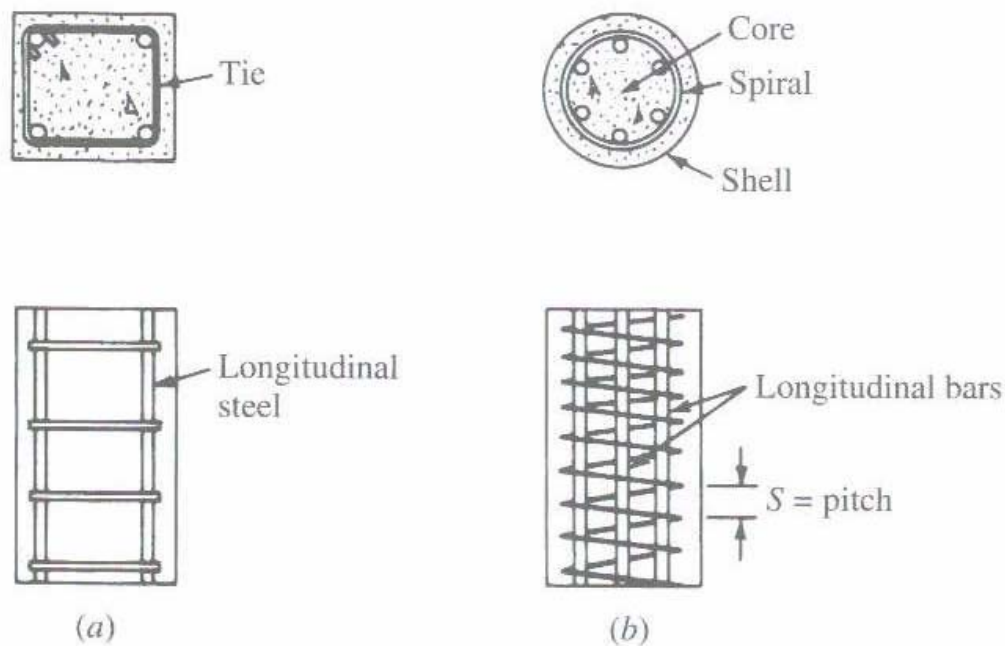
Types of columns: a) tied column, minimum of four longitudinal bars required in a rectangular column; b) spiral column, minimum of six longitudinal bars required. [5]
